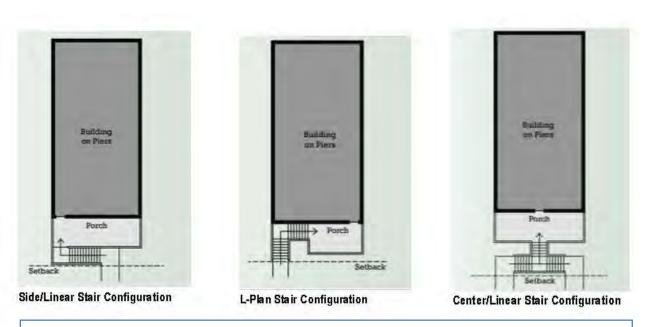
Configurations for stairway entries promoting inviting entrances from the public realm on an elevated building, as illustrated in the City's Smartcode.
